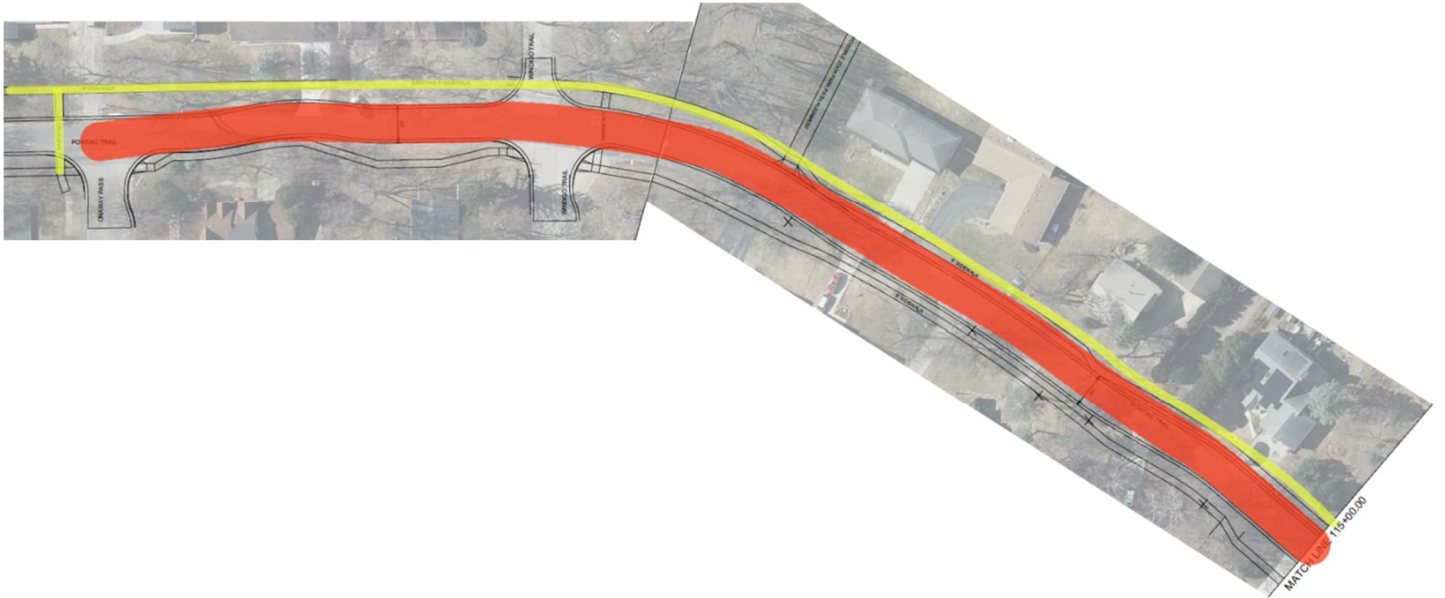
Middle Segment – Sidewalk on west side (yellow). Road (red) is aligned to preserve greenspace. On the East side there would continue to be green space and canopy trees. Sidewalk shown on plans would not be built to preserve the x out trees and allow additional plantings, rain gardens and vegetation.
